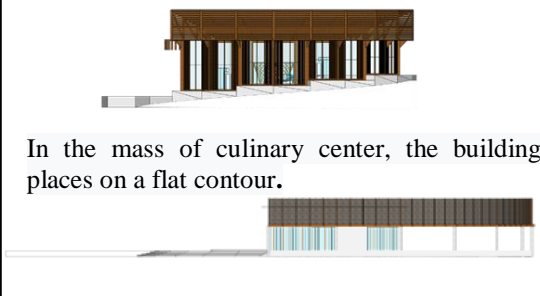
The concept of Appreciate the site in Design of Building Design Culinary and Shopping Tourism Centers in the Village of Tongging
